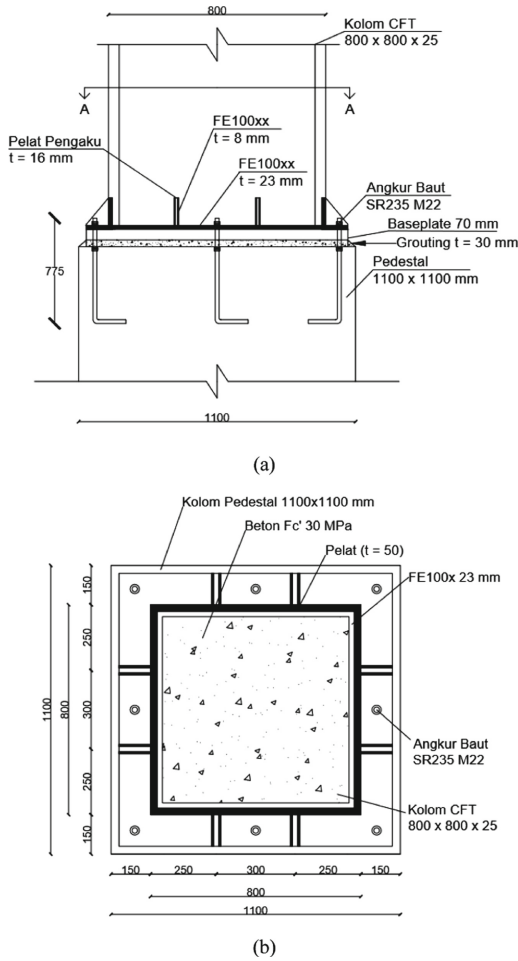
(a) Column and Baseplate Connection (b) Section A-A of Column and Baseplate Connection.
